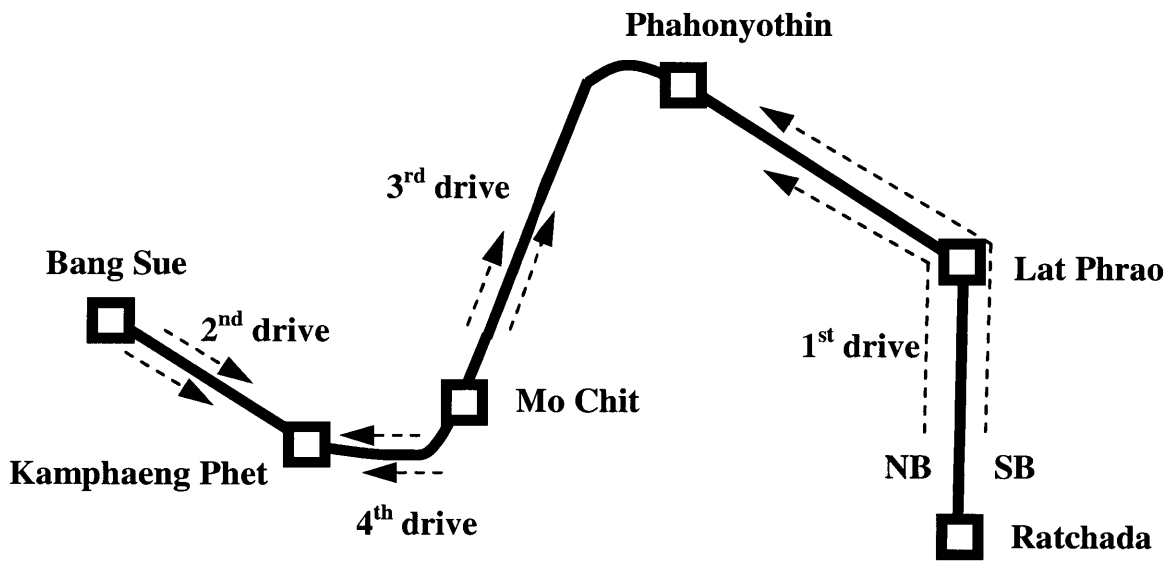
Tunnel drive sequence of Section B (North Section)
